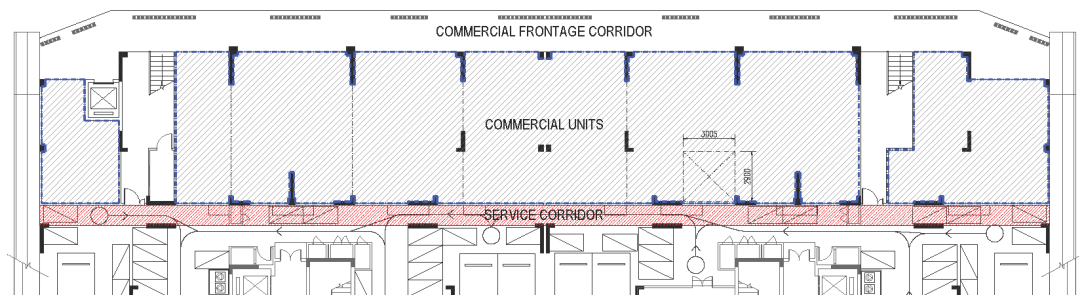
Typical commercial floor plan with 1200mm wide service corridor behind. (Marked in red)
